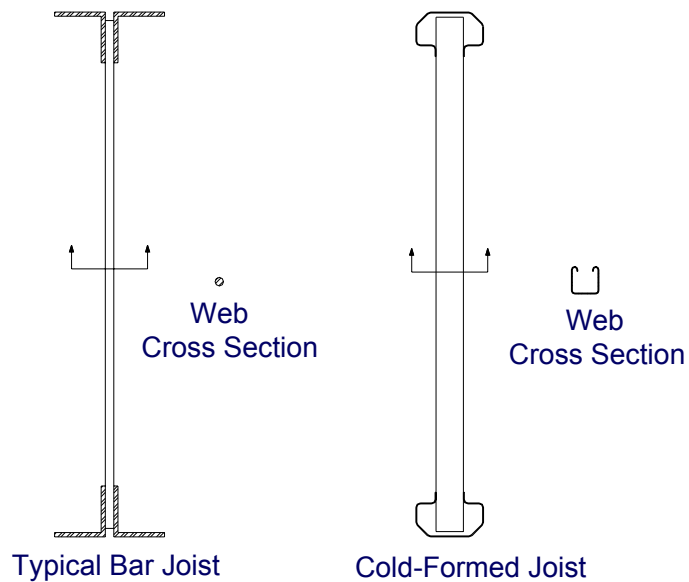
Bar Joist vs. Cold-Formed Joist – Section view
